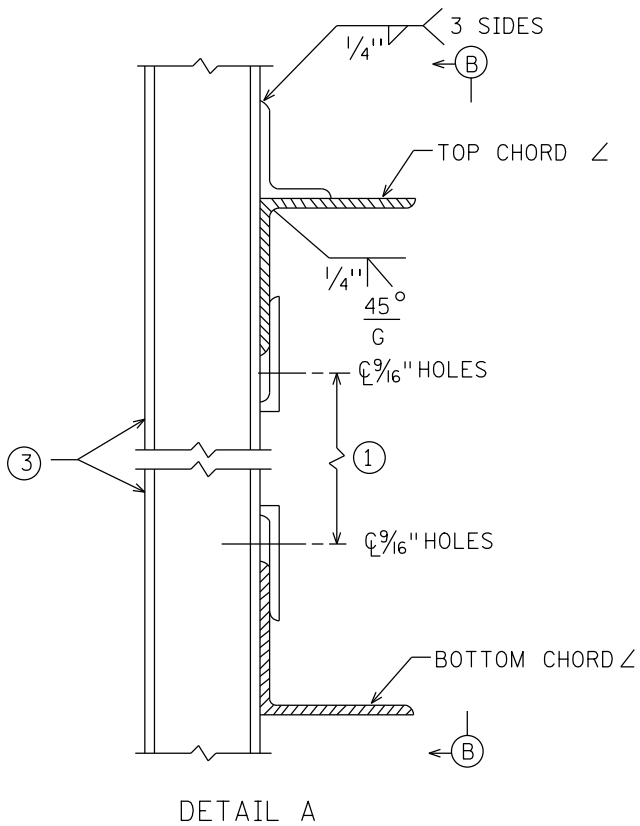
DETAILS SHOWN ARE FOR THE FREE ENDS OF THE CANTILEVER SPANS. ALL OTHER DETAILS FOR CANTILEVER TRUSSES SHALL BE AS SHOWN FOR THE SIMPLE SPANS.
